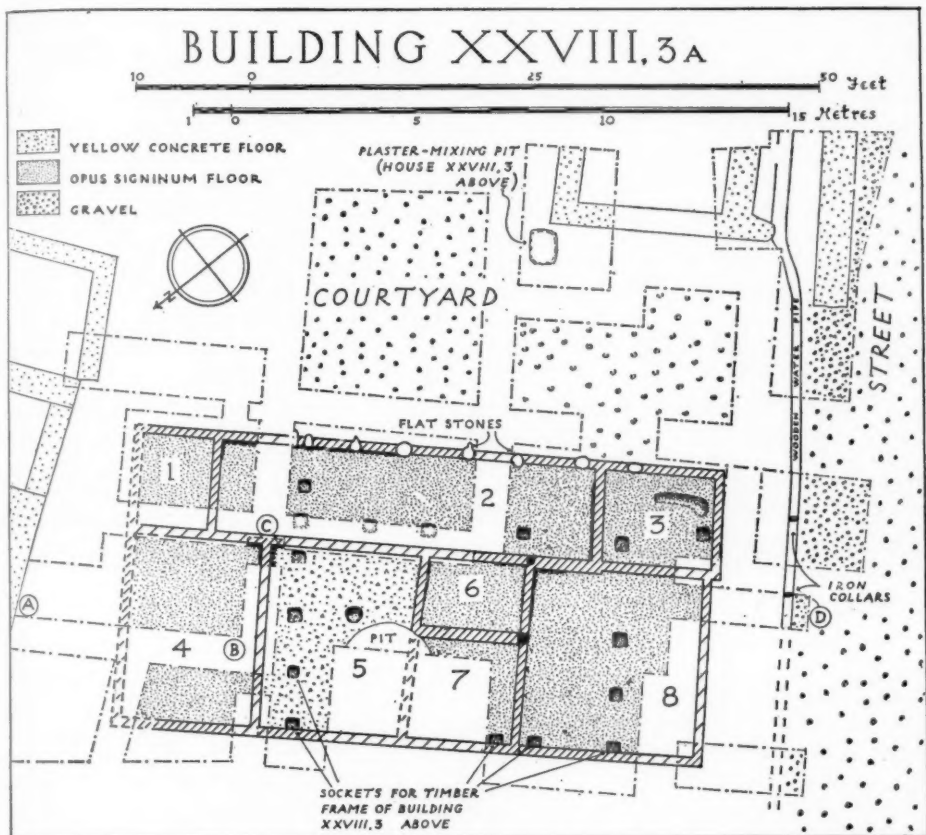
Second-century timber-framed building below building XXVIII, 3.
